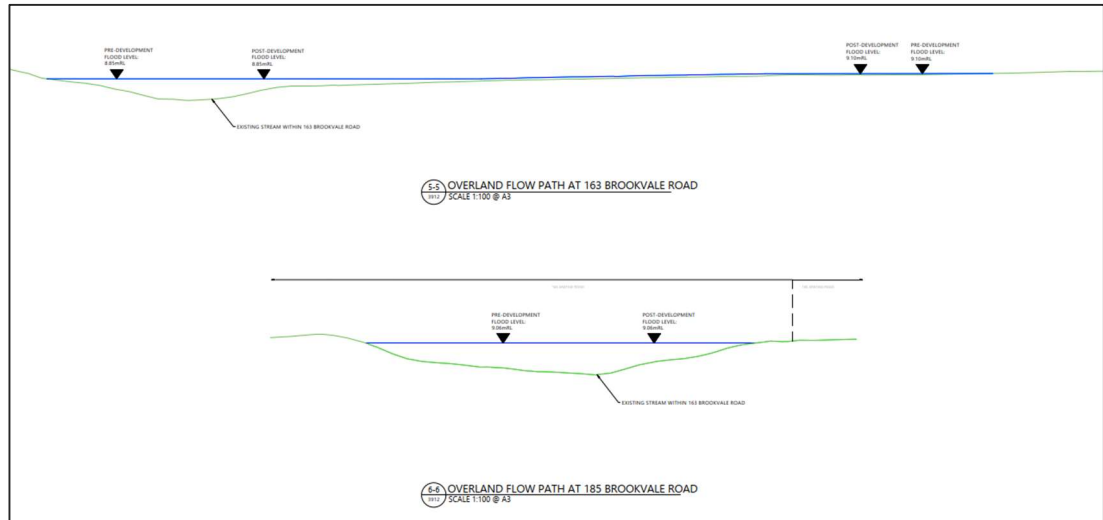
Water surface elevation - Cross sections along Brookvale Road – 163 and 185 Brookvale Road
